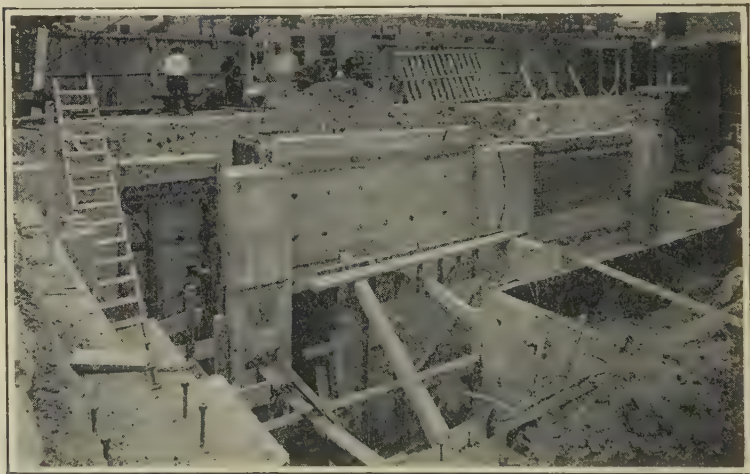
TYPICAL FOUNDATION WORK ON SUBSTATION JOB.
